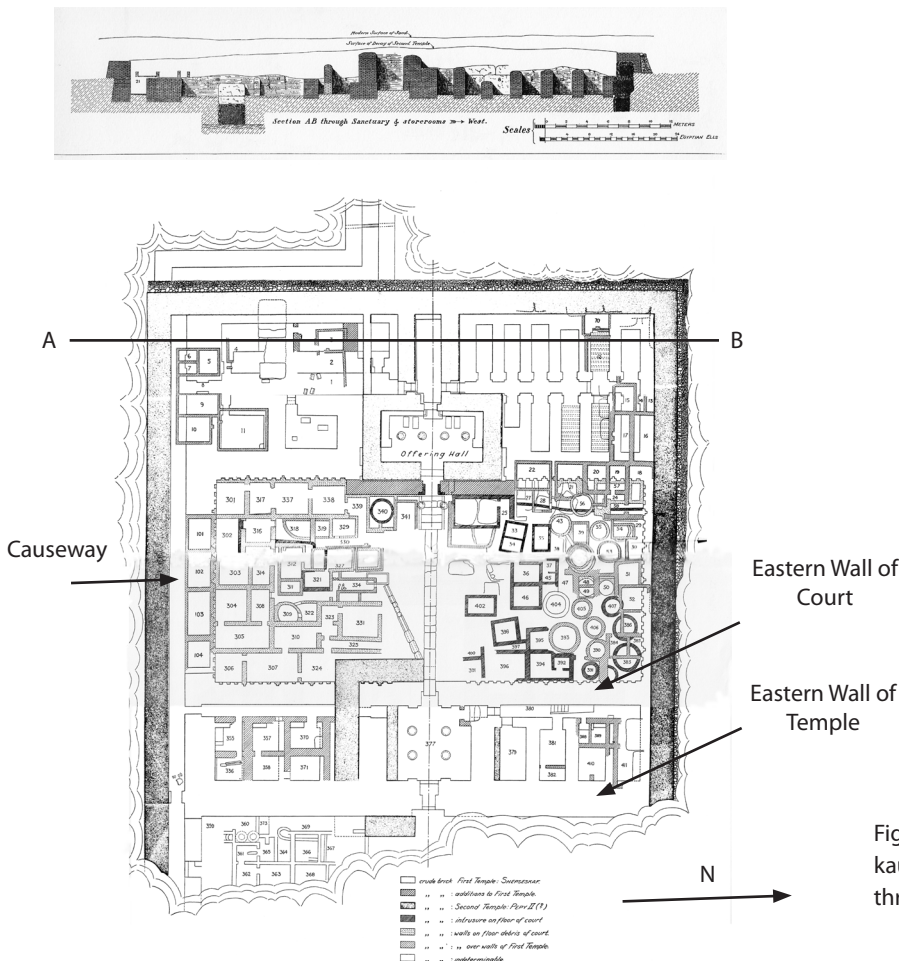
George Reisner's plan map of the Menkaure Valley Temple. At the top is a sectional view through the section A-B (Reisner 1931: Plan VIII).
